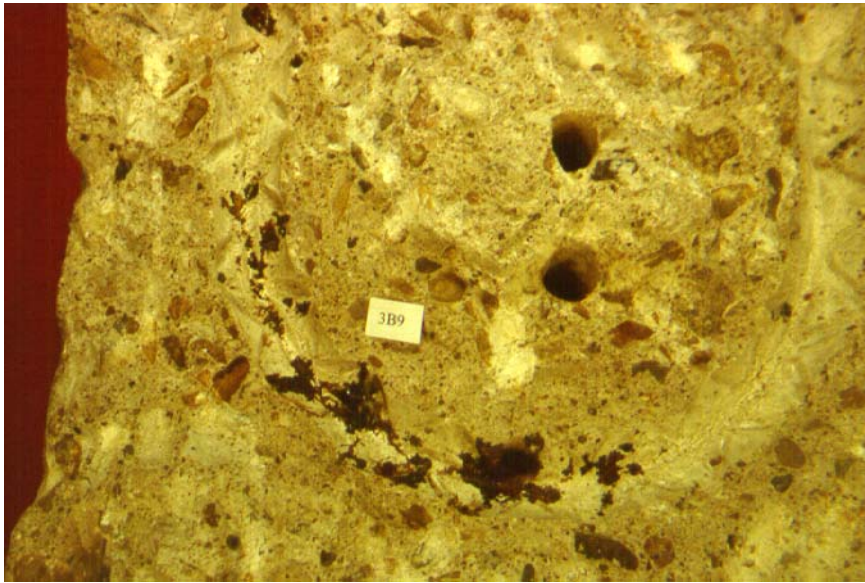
Damage on Concrete for Epoxy Coated Bar (3B9).
